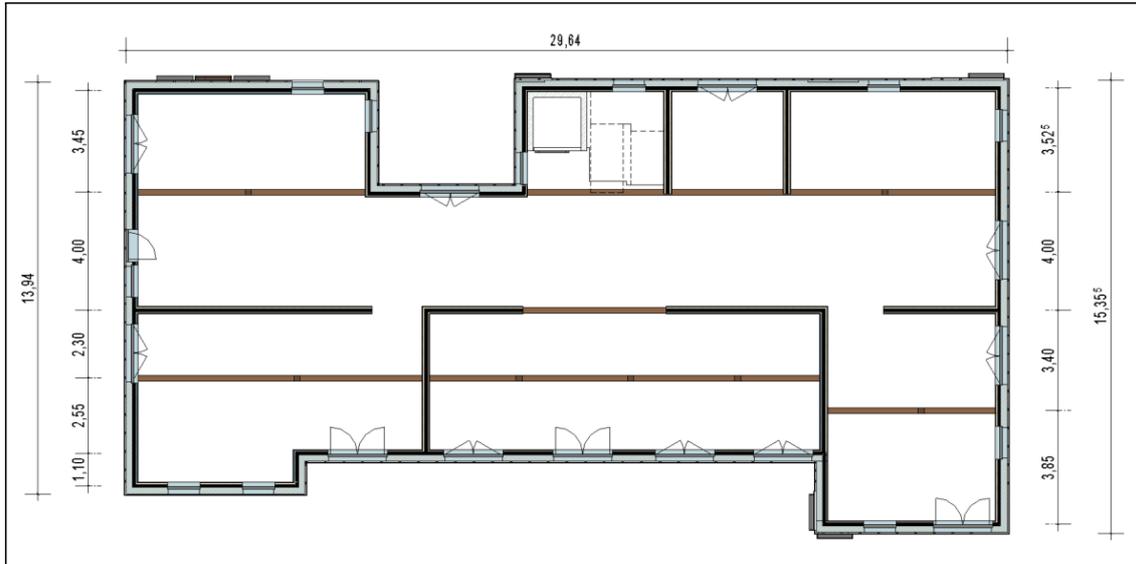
Plan view of load-bearing components for vertical and horizontal bracing on the first floor (screenshot in *Revit*)
